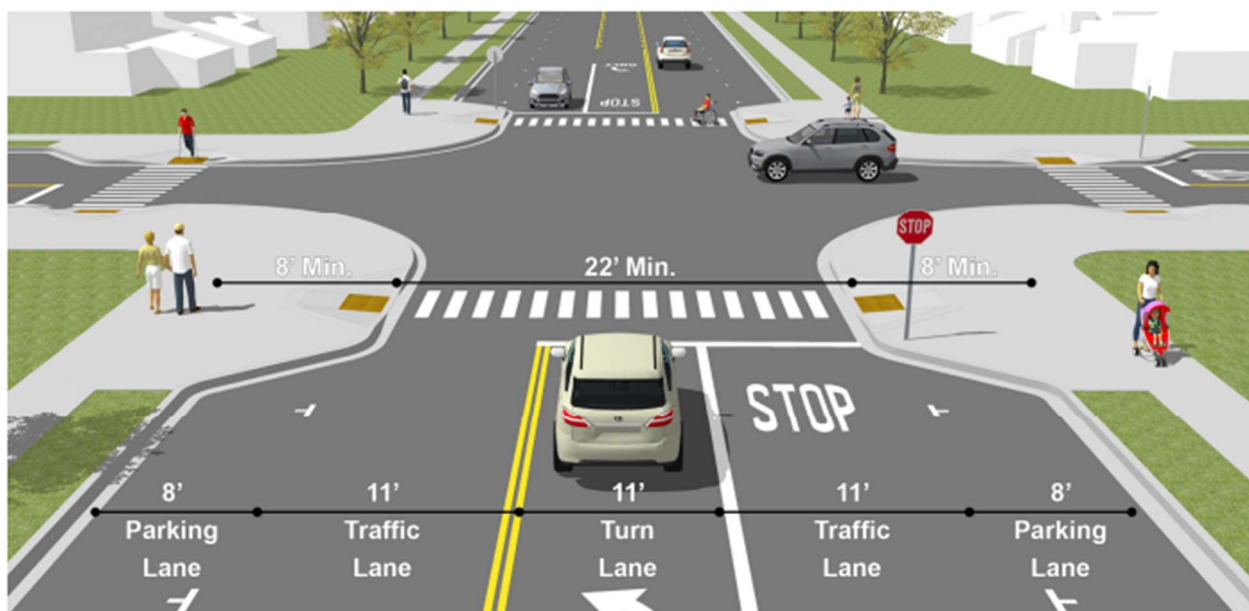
Typical Cross Section with Curb Extensions (Source: SDC ATP: Appendix B – ATP Toolbox)
